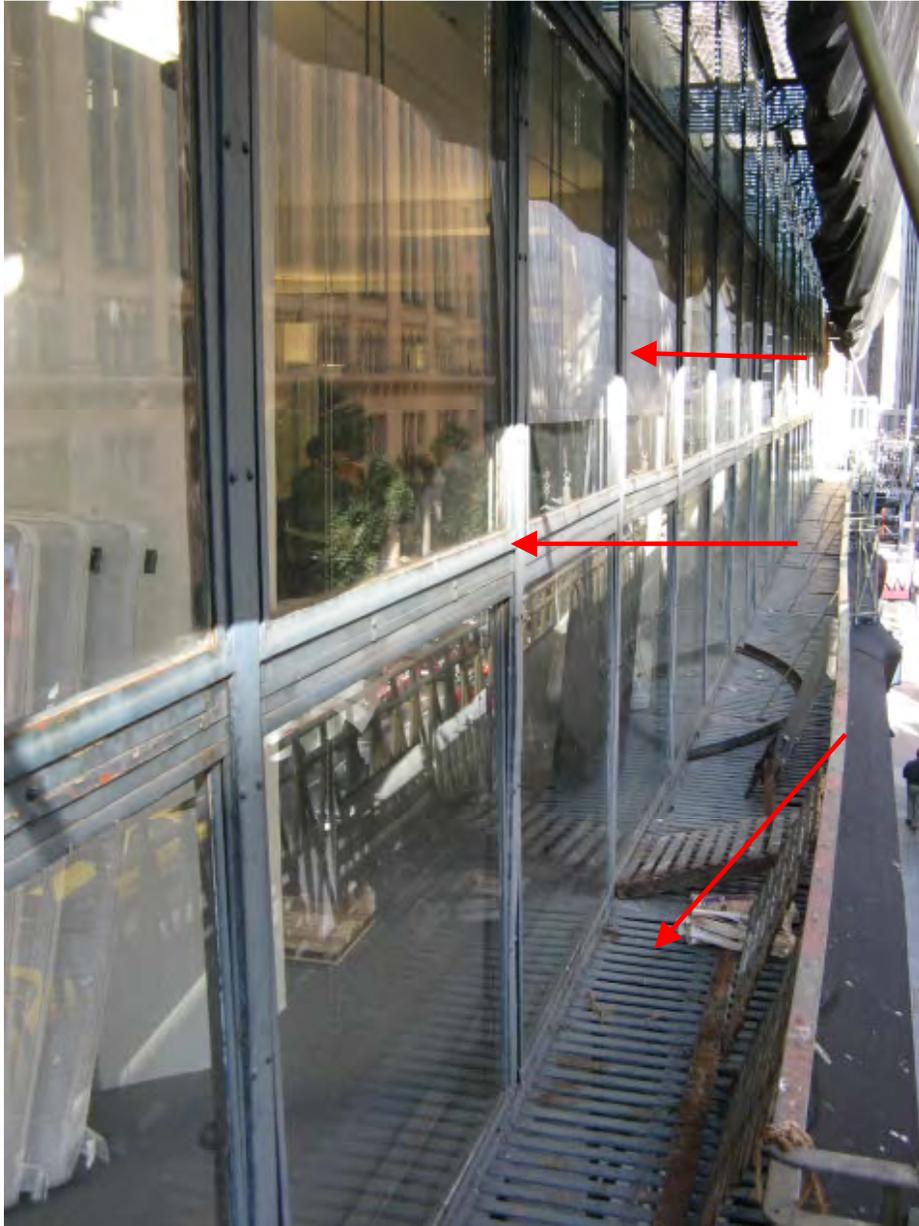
Hallidie Building, second story balcony. Red arrows denote the location of paint samples taken from mullion, window frame and balcony.
